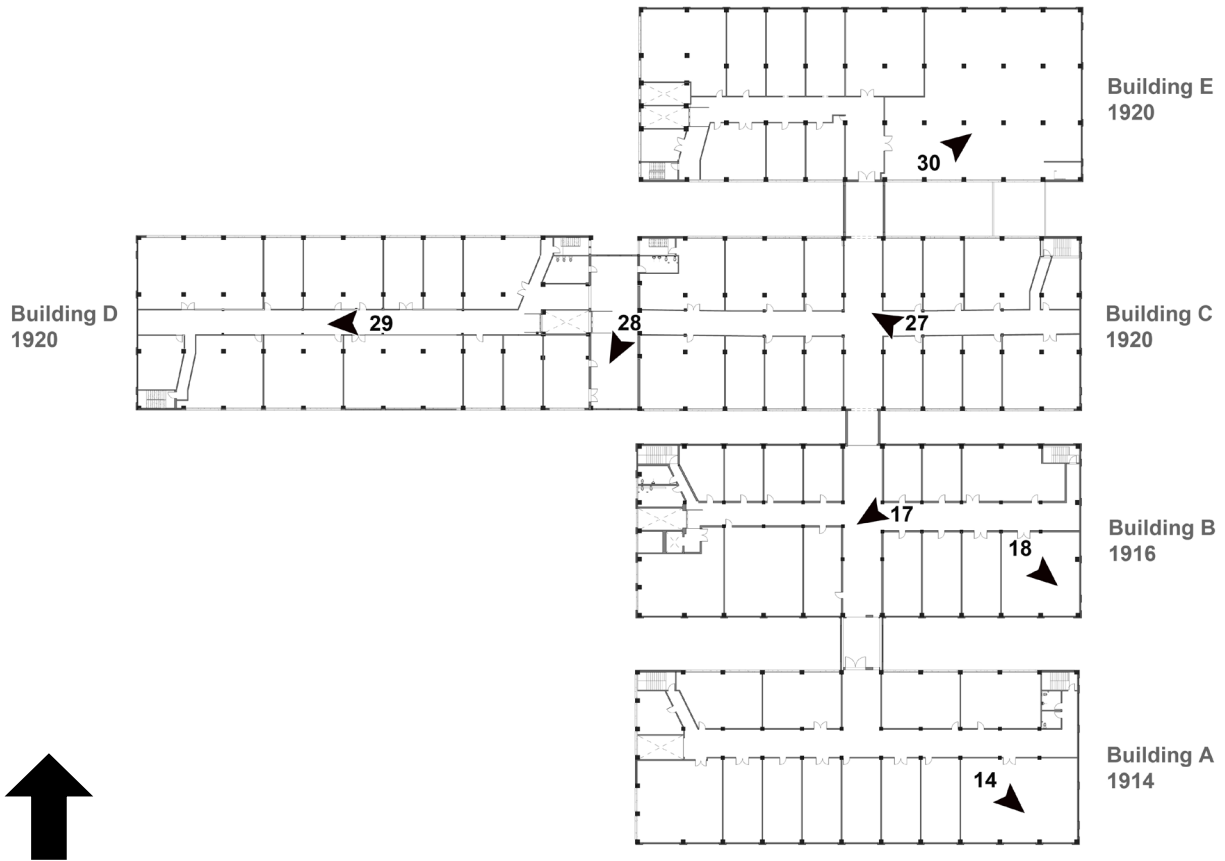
Third floor photo key and current floor plan. Not to scale. Base plan from Delv Architecture.
